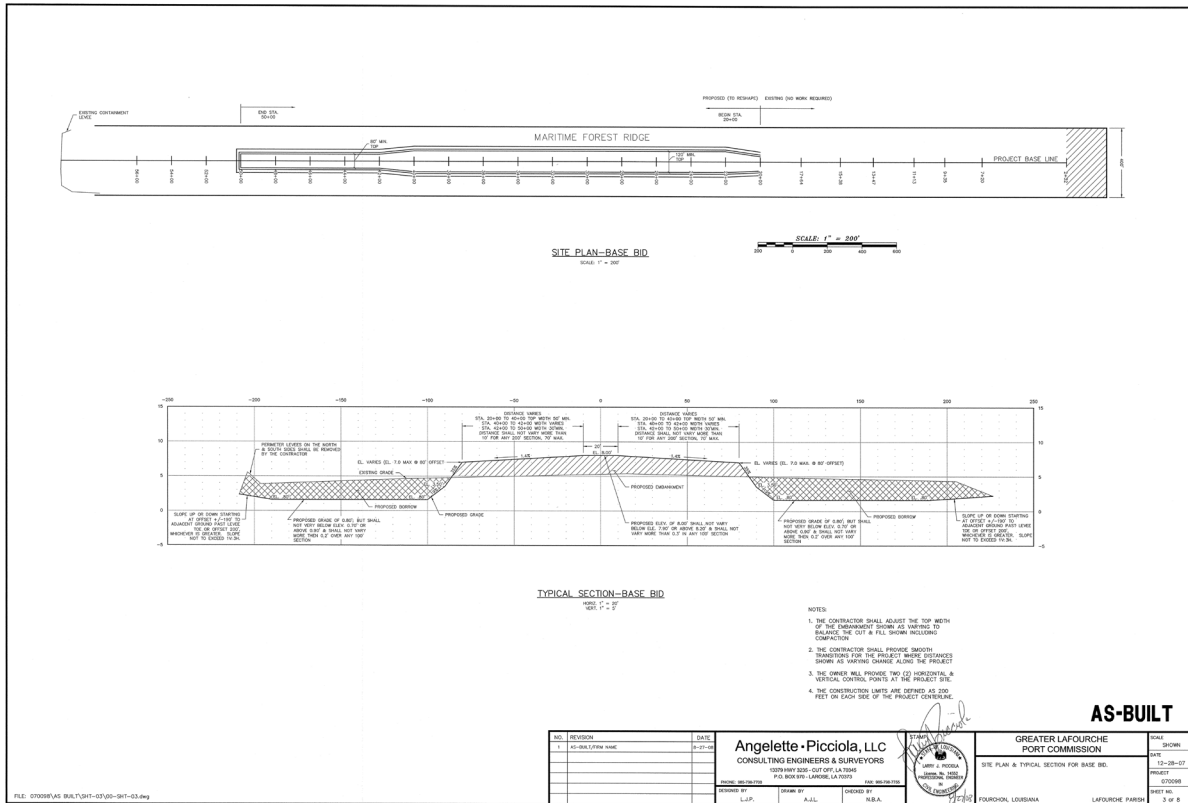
Site plan and typical section for base bid, Phase Two, August 27, 2008.
